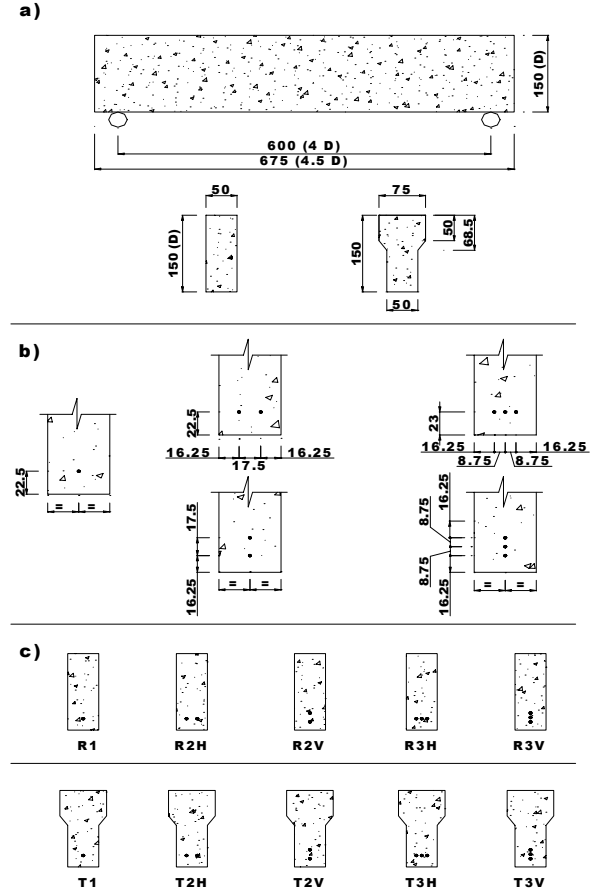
(a) Rectangular and T cross-section dimensions; (b) rebar arrangements; (c) specimen nomenclature.
